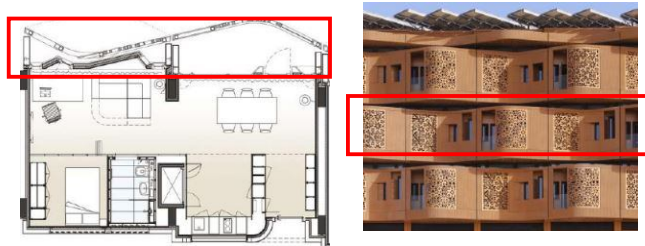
Plan shows the Mashrabiyya design on the left side, and the elevation on right side shows Mashrabiyya’s exterior
